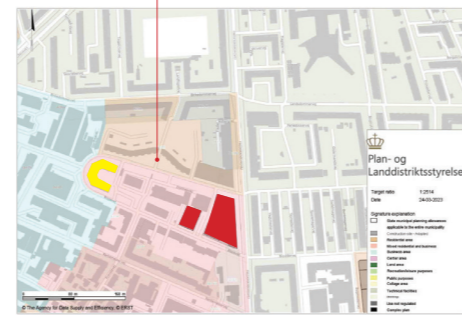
, Situation Plan of Dortheavej (red dot), construction site (red area), and added floor on original building (yellow area)
